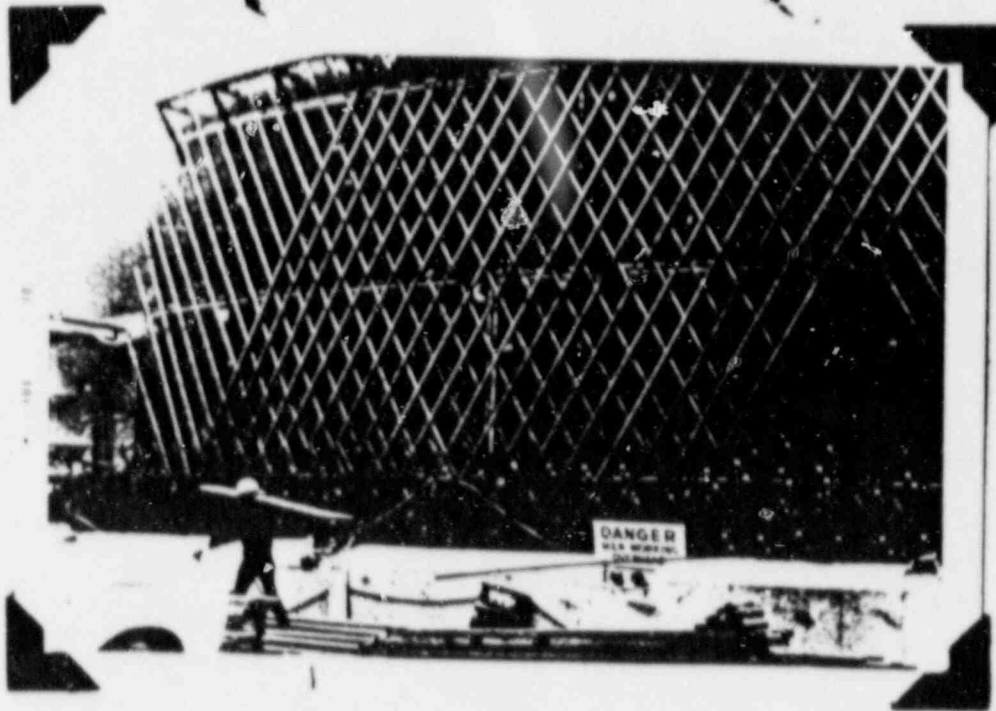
Diagonal Reinforcing Steel for Diablo Canyon Unit No. 1 Containment Building
